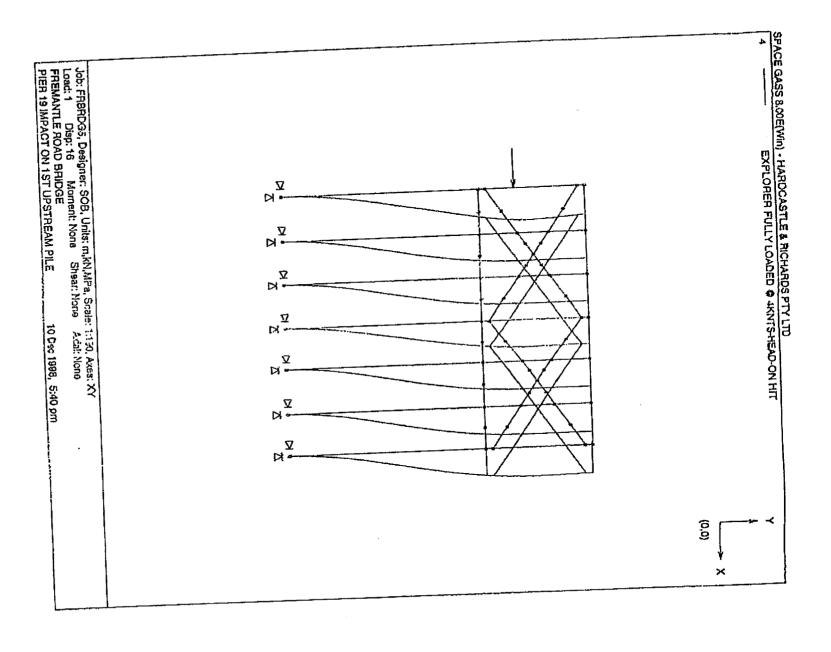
Vessel Size 1 Striking the Non Navigation Span First Pile
